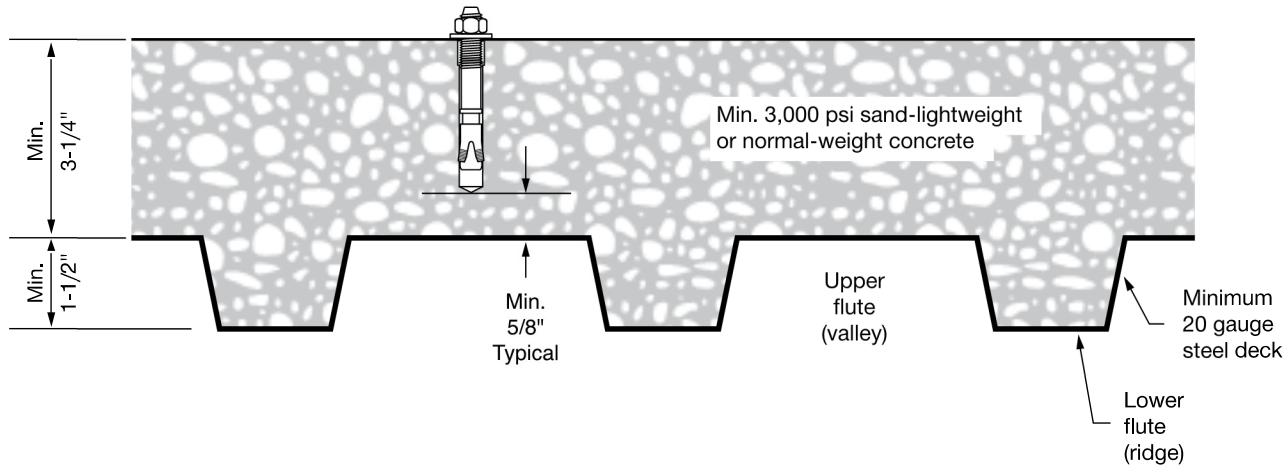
Installation of the KWIK Bolt TZ on the top of sand-lightweight concrete over metal deck floor and roof assemblies
